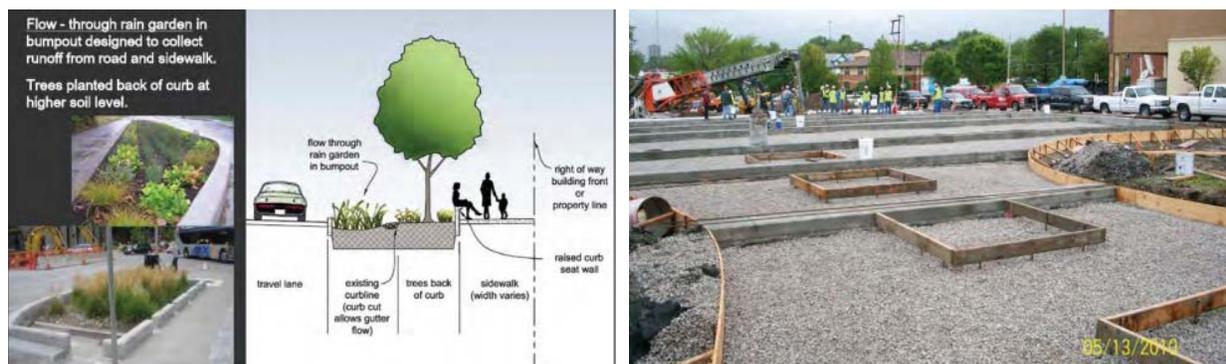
Streetscape of Kansas City Rain garden bumpouts (left); Kansas City pervious pavement park-and-ride lot (right).
